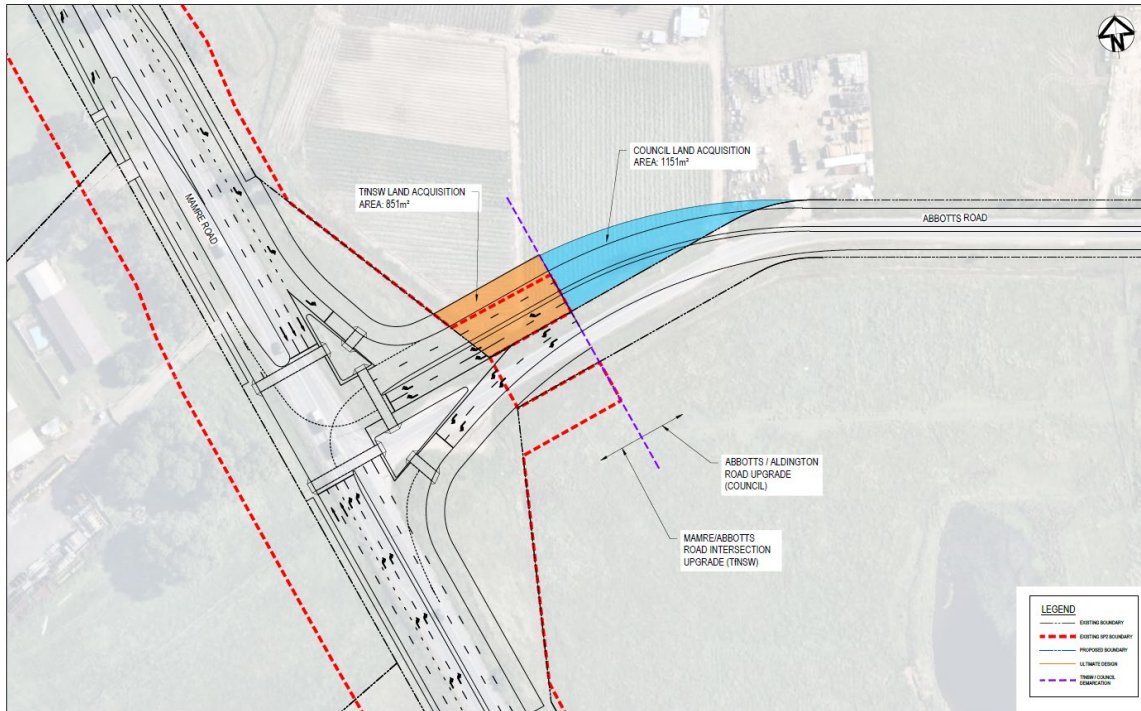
| Proposed interim signalled Mamre Road / Abbots Road intersection
